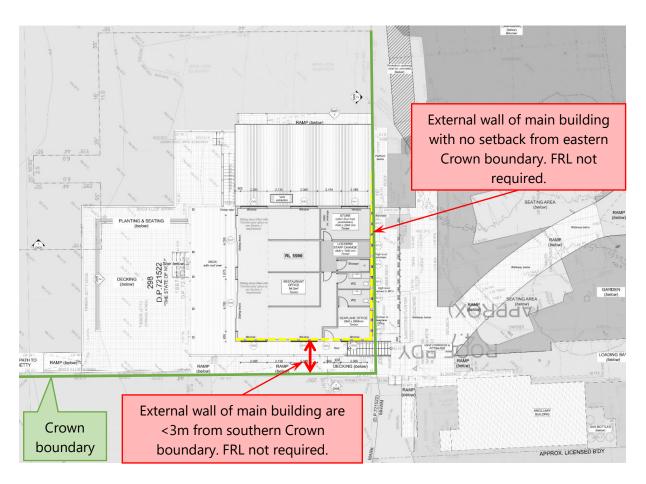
External Walls and Unprotected Openings within 3m of Crown Boundary / Site Boundary
